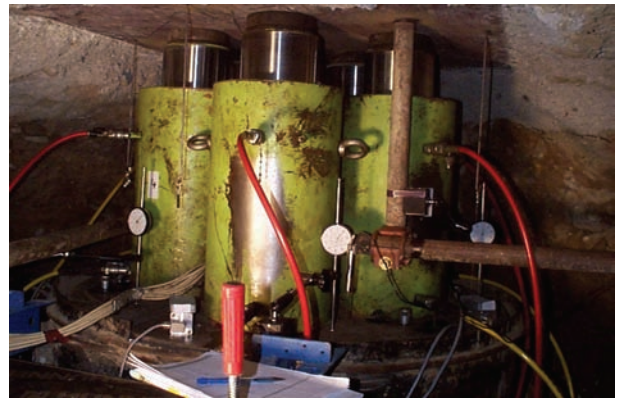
Hydraulic jacks and measurement equipment at the end of loading test.
